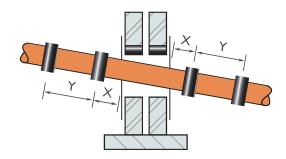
Diagrammatic sections showing pipes passing through walls
